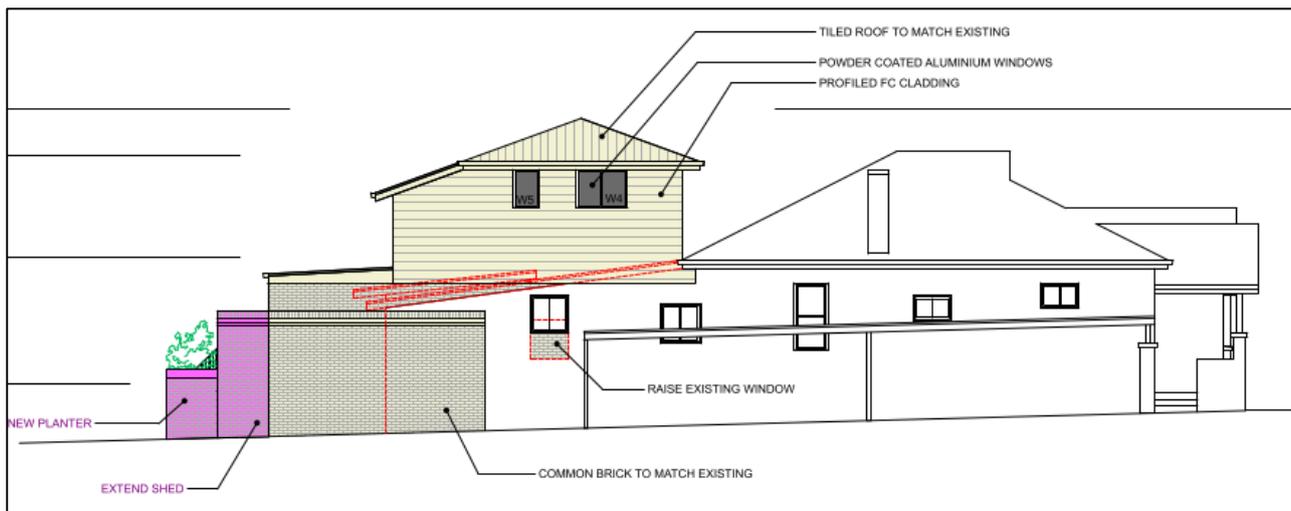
Eastern elevation plan illustrating the original approved development (yellow) and proposed amendments (fuchsia).
